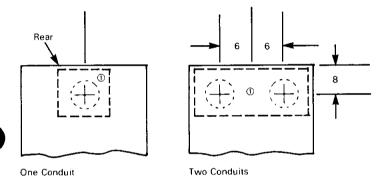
Fig. B — For Entrances Into Cable Enclosure (Or Cable Enclosure Area)
